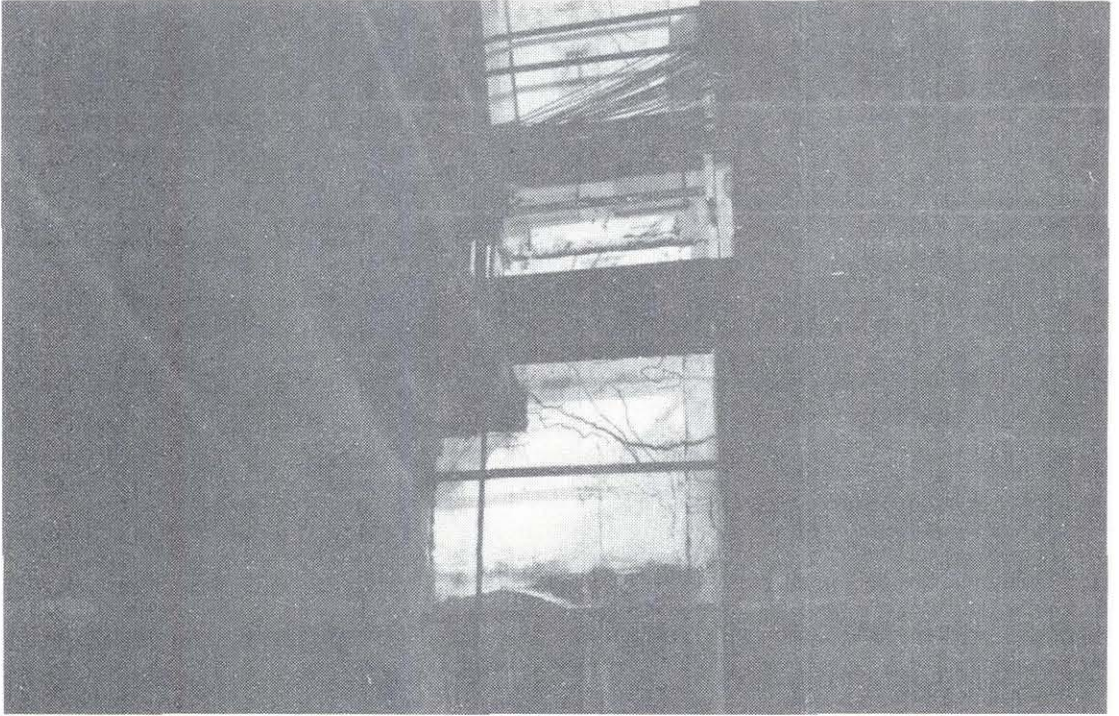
Bent 46, west column shear key opening and horizontal flexural crack at lower deck level (bottom of upper column) under 4000 kip load.
